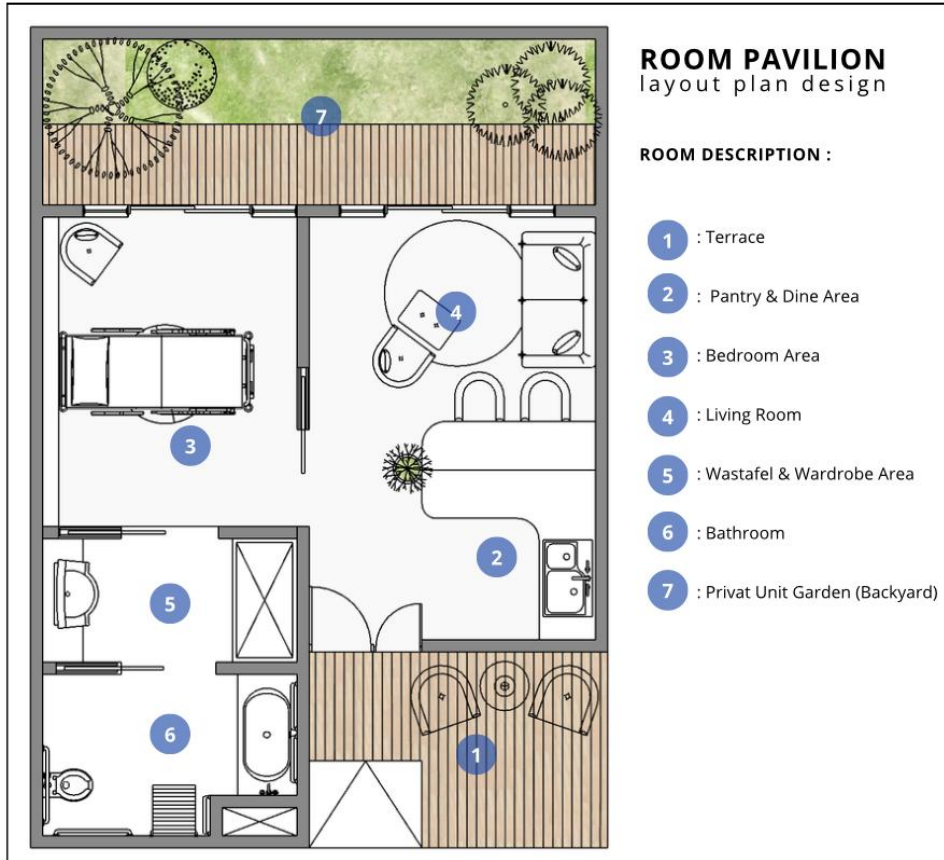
Layout-Plan Design Recommendation of Pavilion Unit
